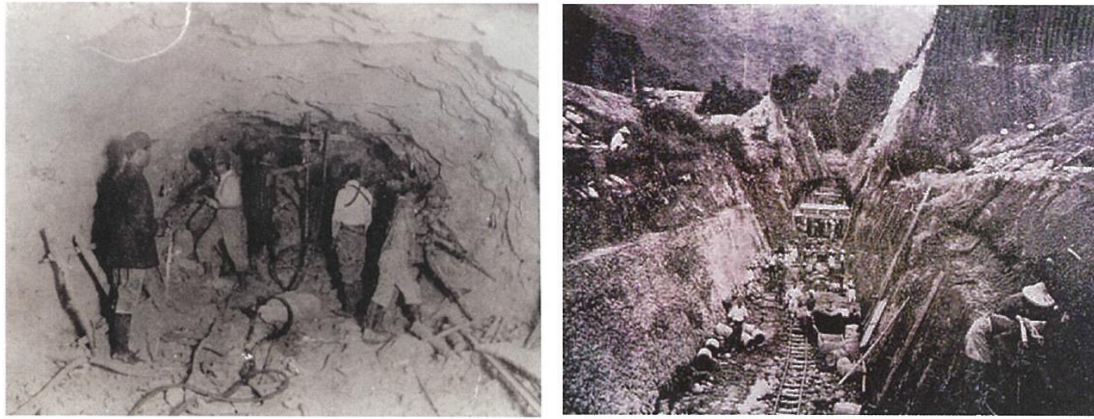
Building process of Wu-Shan-Ling Tunnel (historical photo).
